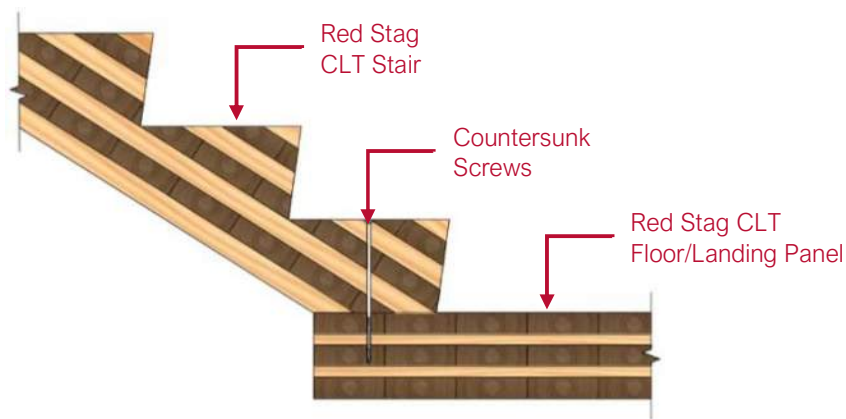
Red Stag CLT stair panel to CLT landing/floor panel connection.
